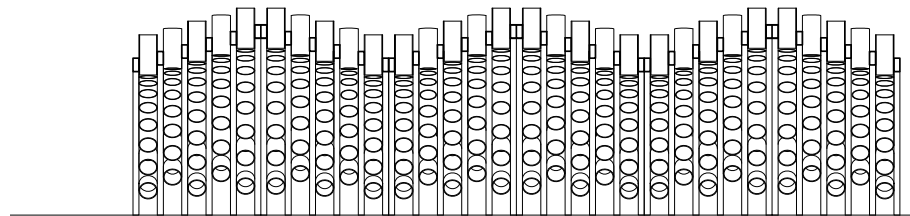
WUST Pavilion, version 3, section of the pavilion, 2014
